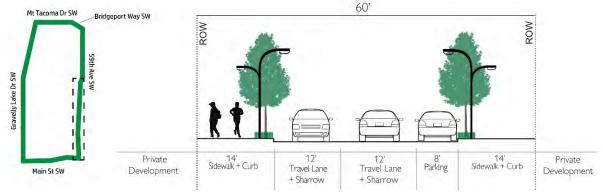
Mt. Tacoma Drive SW and 59th Avenue SW between 100th Street SW and Bridgeport Way SW
